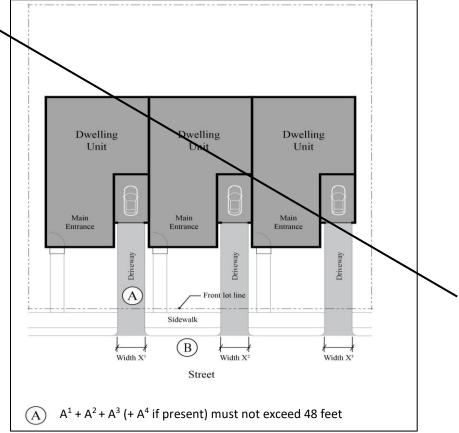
Triplex and Fourplex: Width of Garages and Parking Areas
